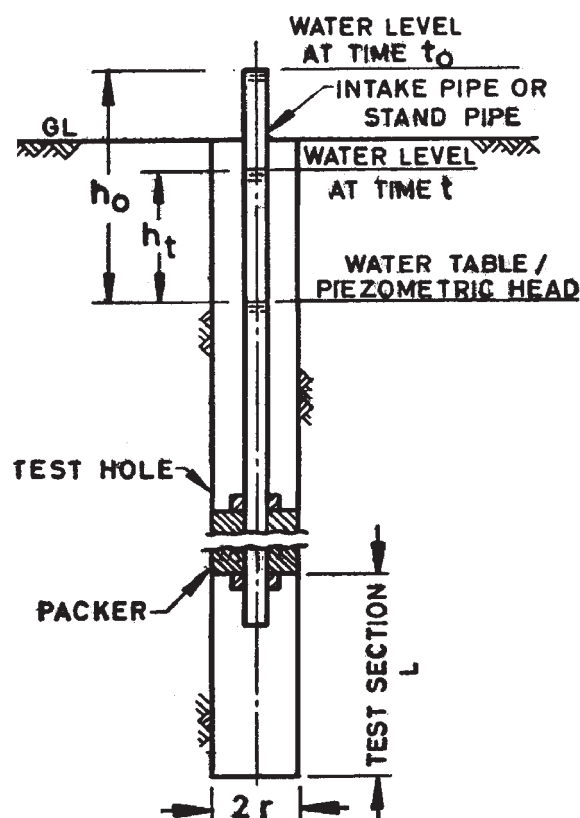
SET-UP FOR FALLING HEAD METHOD
